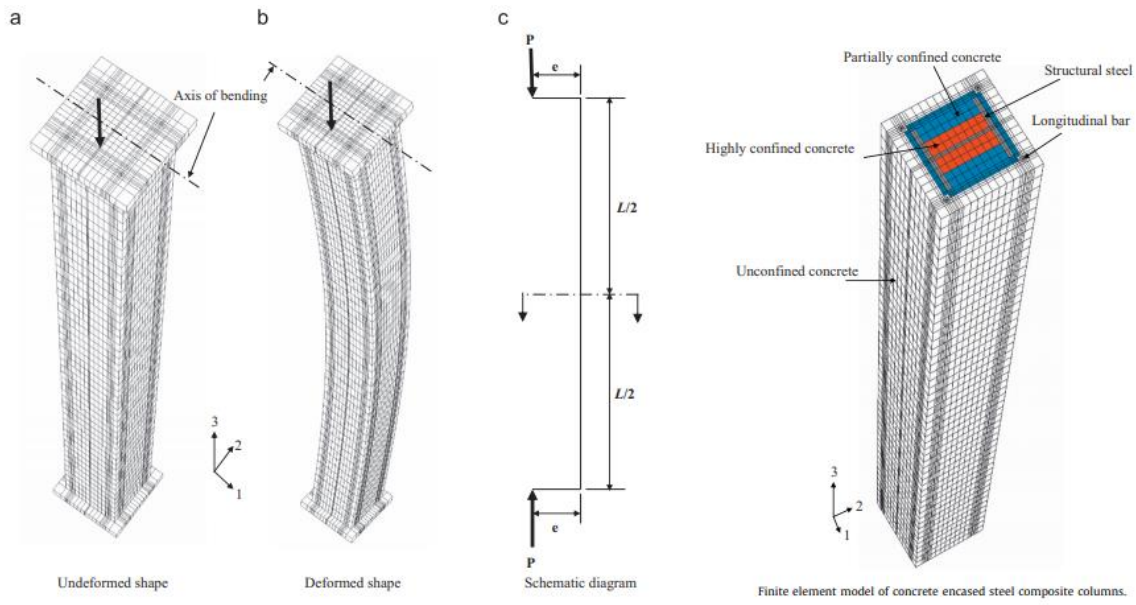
shows finite element model of concrete encased steel composite columns. Ellobody, Young and Lam (2010)
